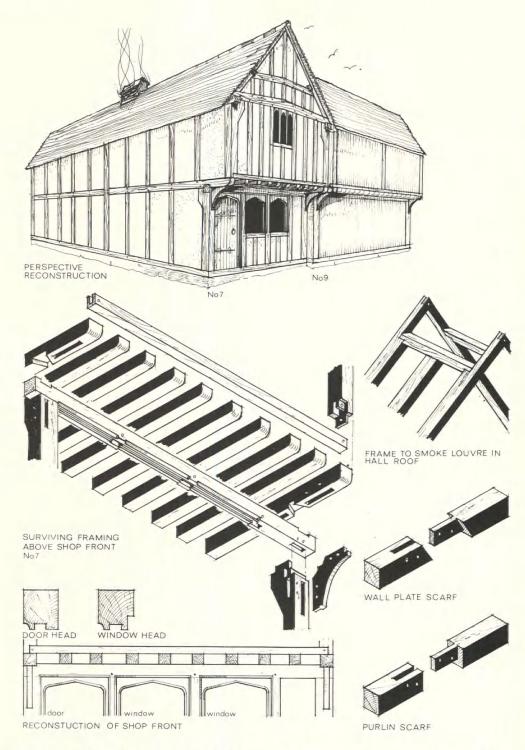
Nos 7 and 9 West Street, Dunstable: perspective reconstruction and framing details.
